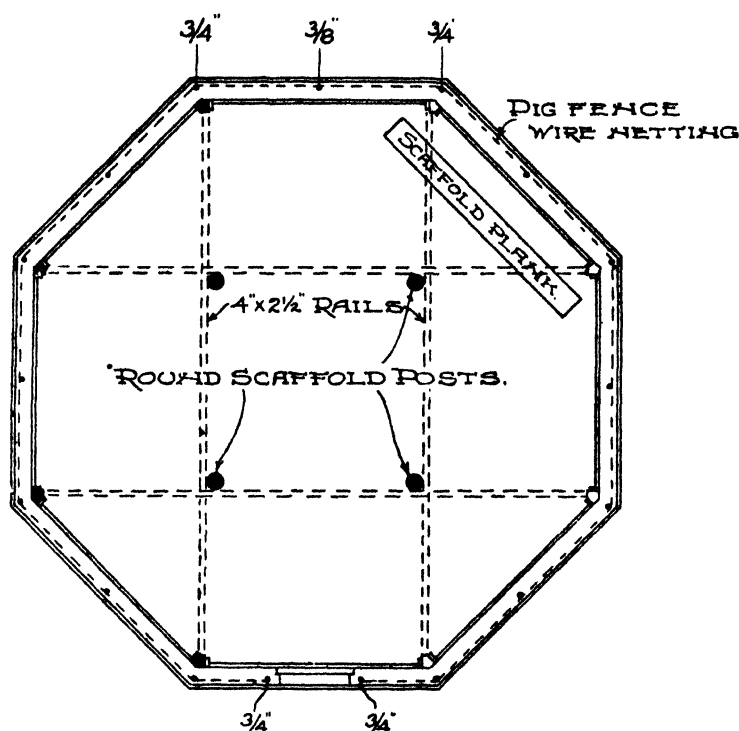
Plan of Octagonal Concrete Silo, showing Framing for Concrete.
